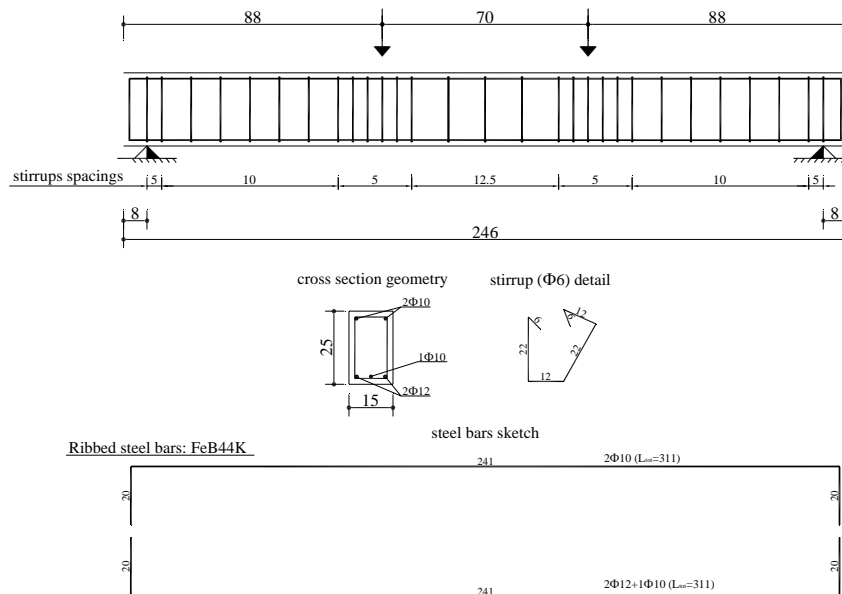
Details of RC beams belonging to groups III and IV
